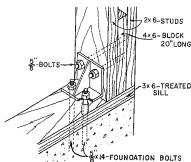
End wall anchor bracket used at outside corners and door openings.
